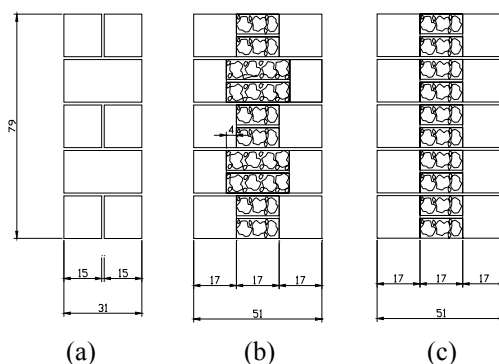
Typical geometry of the tested walls: (a) side view; (b) front view (keyed collar joints); (c) front view (flat collar joints).
